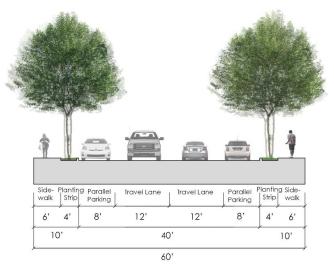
North Pioneer Street section from Lowell Downtown Master Plan.
